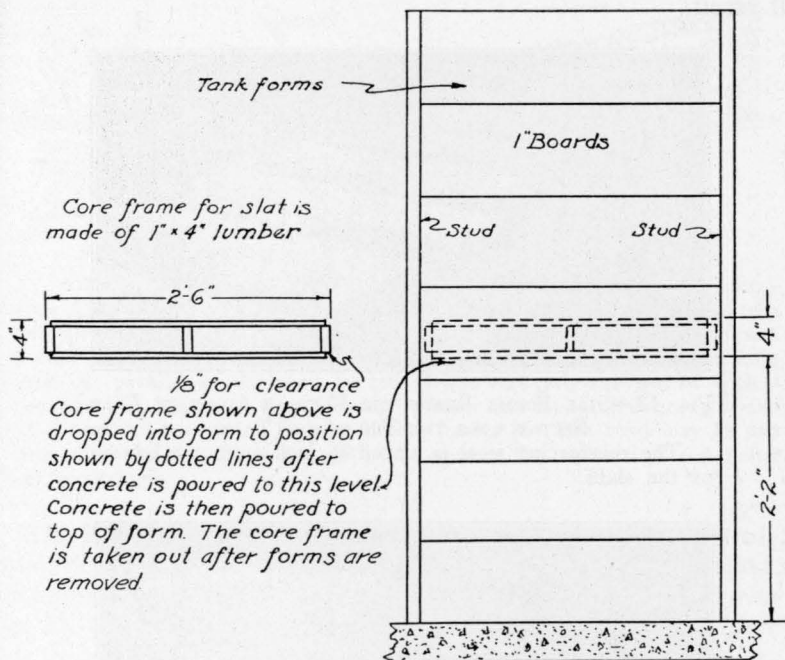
CROSS-SECTION OF THE PARTITION WALL SHOWING THE CORE FRAME IN PLACE
